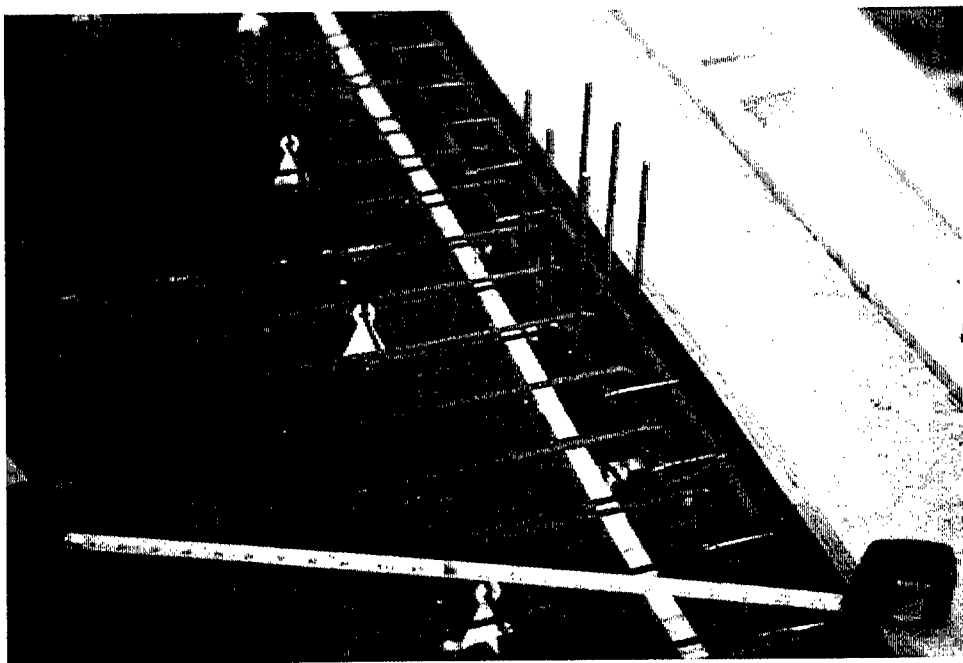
Slab-Spandrel-Exterior Column Joint Reinforcement
